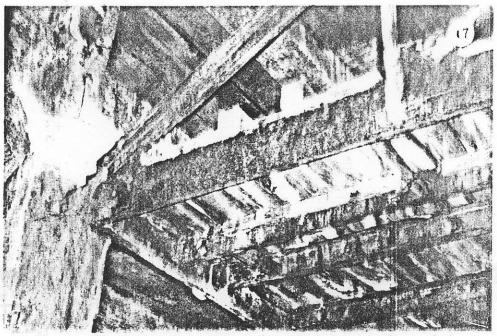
Webs Of Bridge Joists Completely Corroded.
